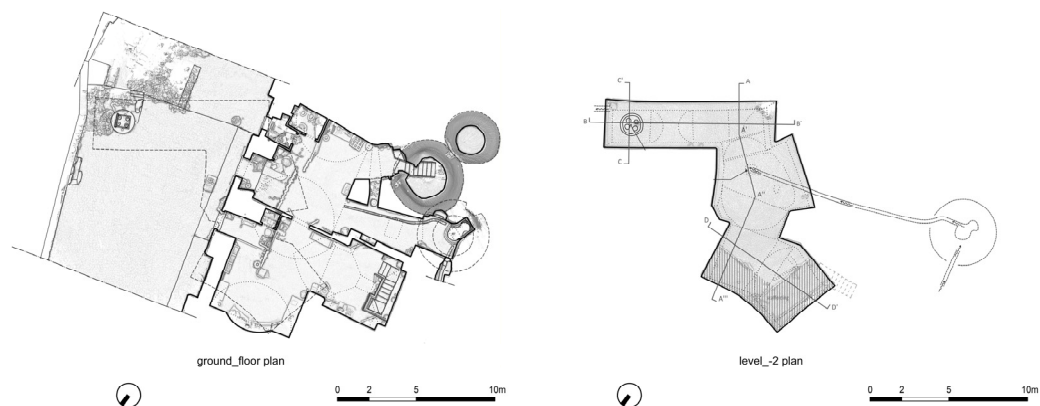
Floor plans for the ground floor and level-2 of the complex.
